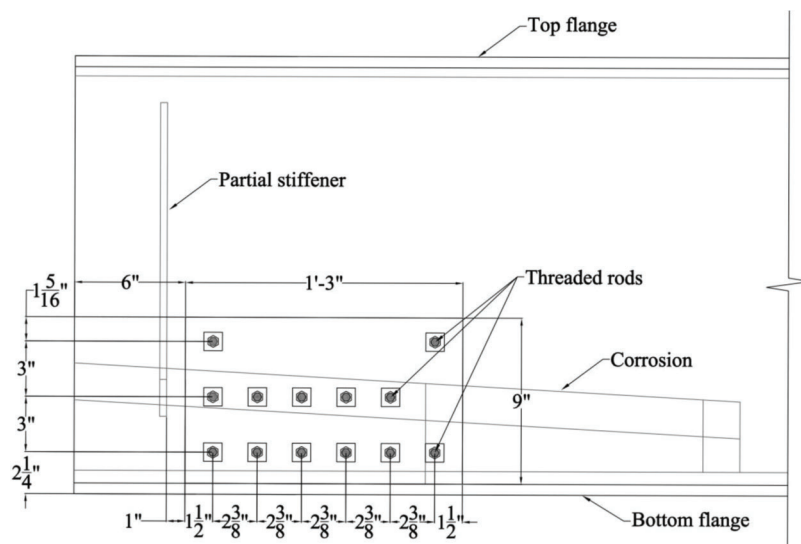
Threaded rod layout for Specimens 3–5: AutoCAD drawing.
